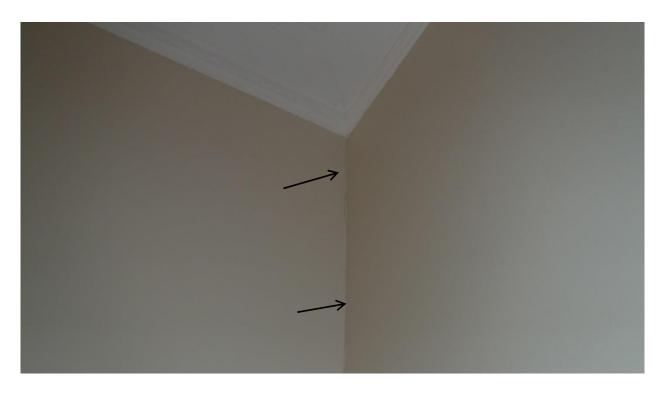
shows separation cracking to the wall / cornice junction of the *common party wall* (eastern wall of the Hallway).
